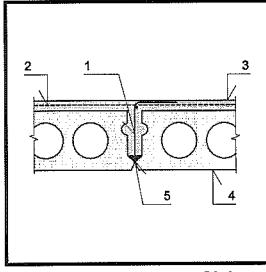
Hollow Core Slab to Slab Joint Detail
